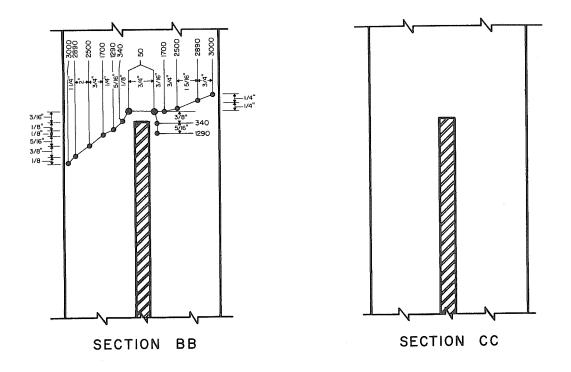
JOINT TYPE 3 - SPECIMEN No. 2 (SCALLOPED GUSSET PLATE) DETAILED CRACK PROPAGATION IN DIAGONAL MEMBER
